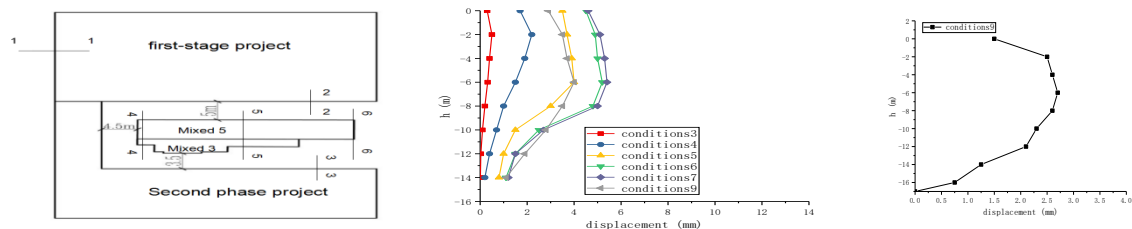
Location of foundation pit section 2-2 Displacement curve of section guard pile Displacement curve of 3-3 profile retaining pile
